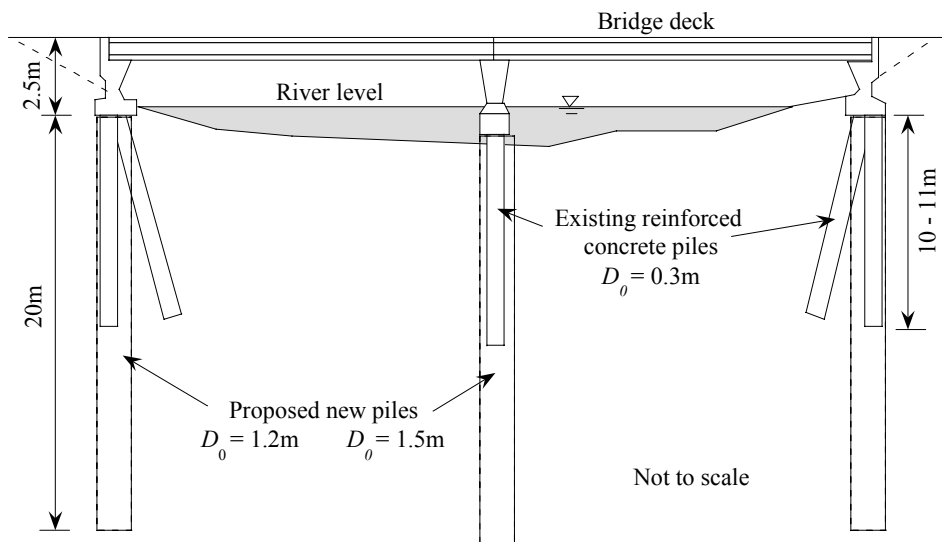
Bridge cross section showing existing piles and proposed new piles.
